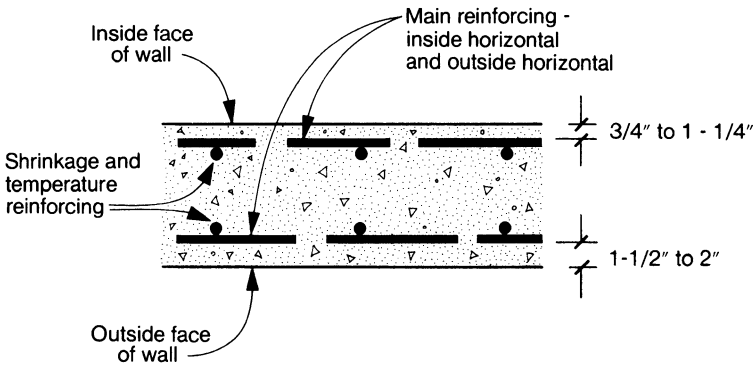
Typical wall reinforcing for horizontal design.
